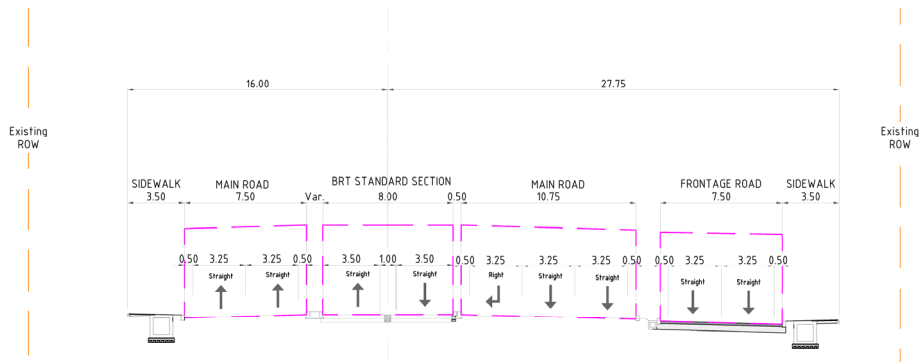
Typical Cross Sections at Mwenge Intersection (Tegeta Side of New Bagamoyo Road)
